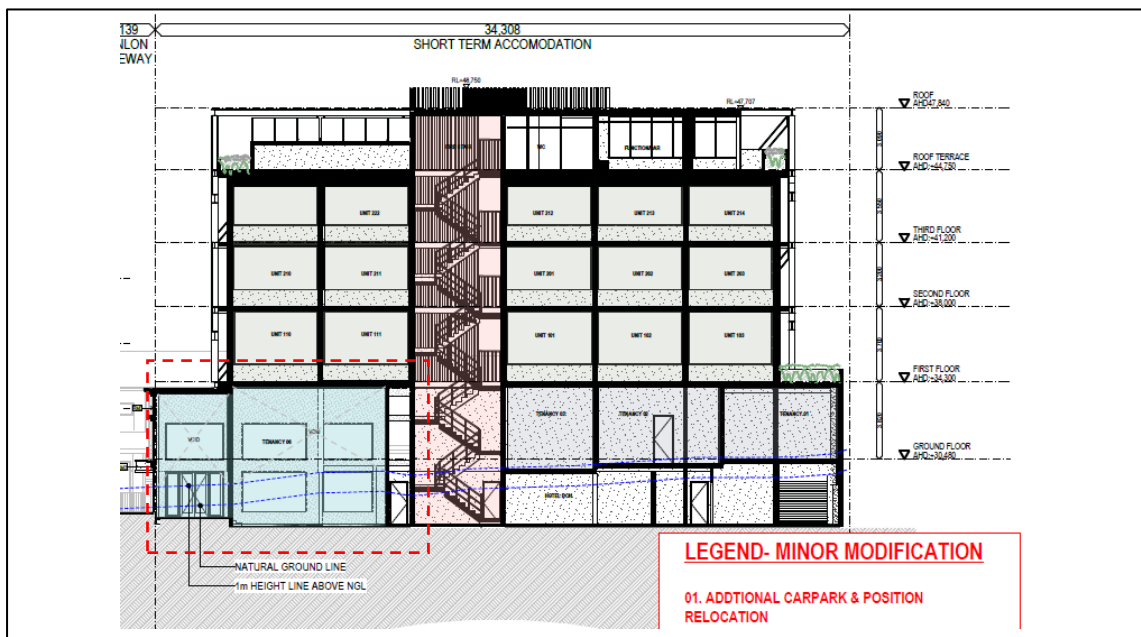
Extract of sections (Source: DAH Architecture, 2026)
